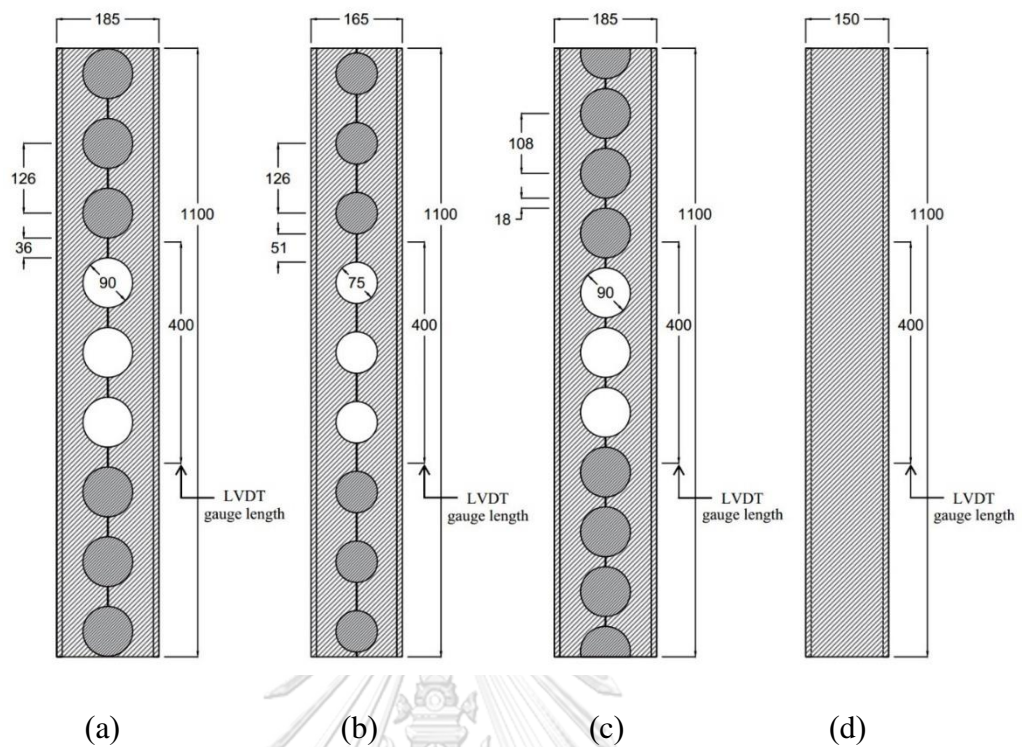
Dimensions of steel members in tested composite columns (a) C1; (b) C2; (c) C3; and (d) W (dimensions in mm).
